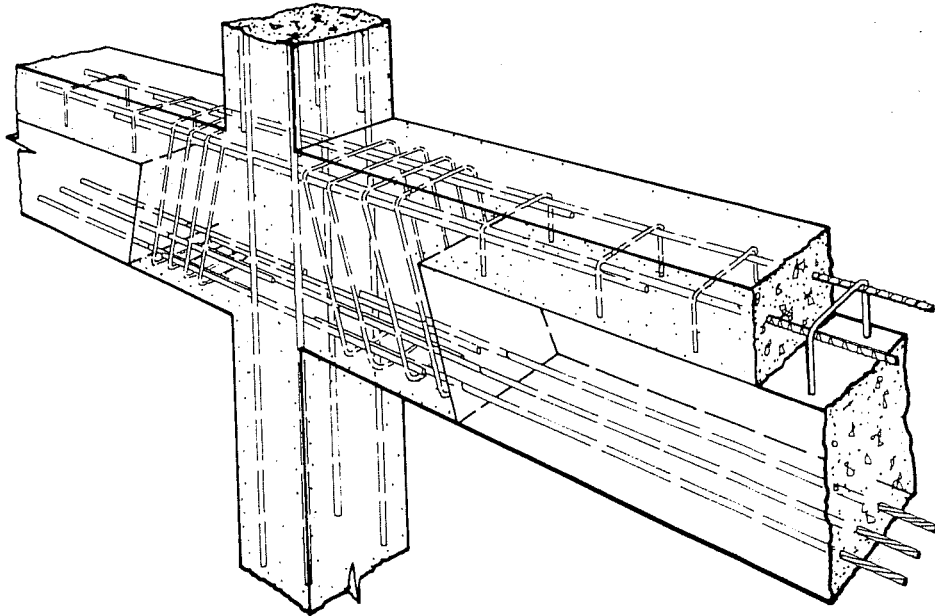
Typical "Rigid" Precast Concrete Beam to Column Connection [15]
